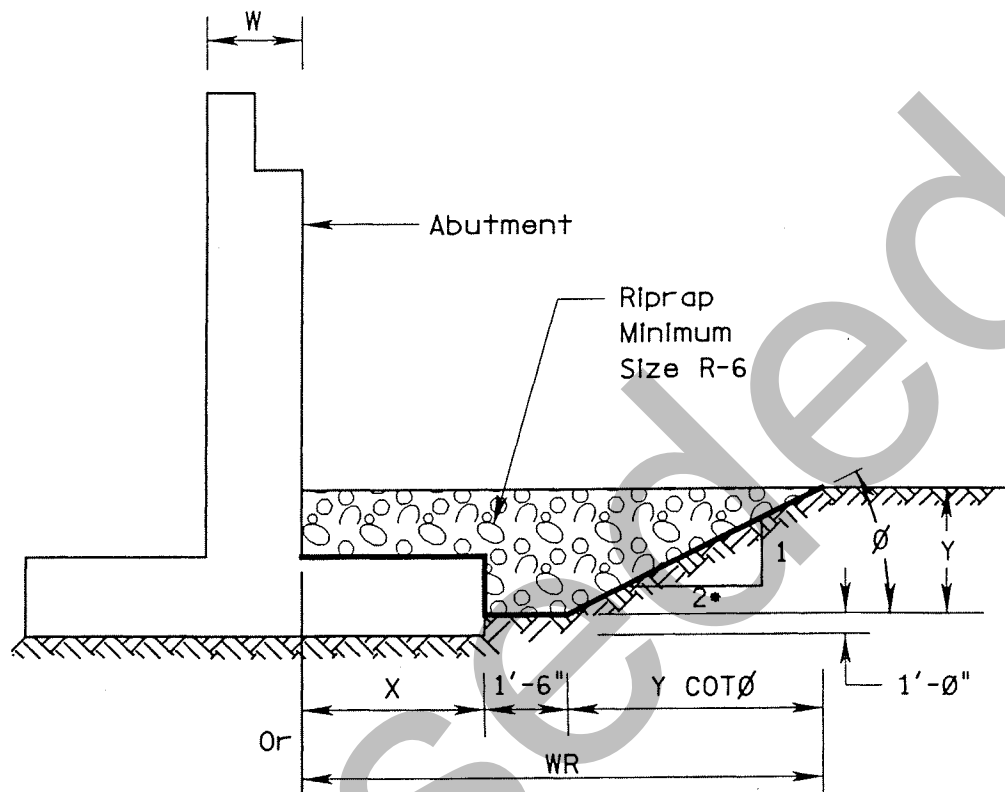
to 1.46.4 provide details for riprap placement at abutments and piers.
